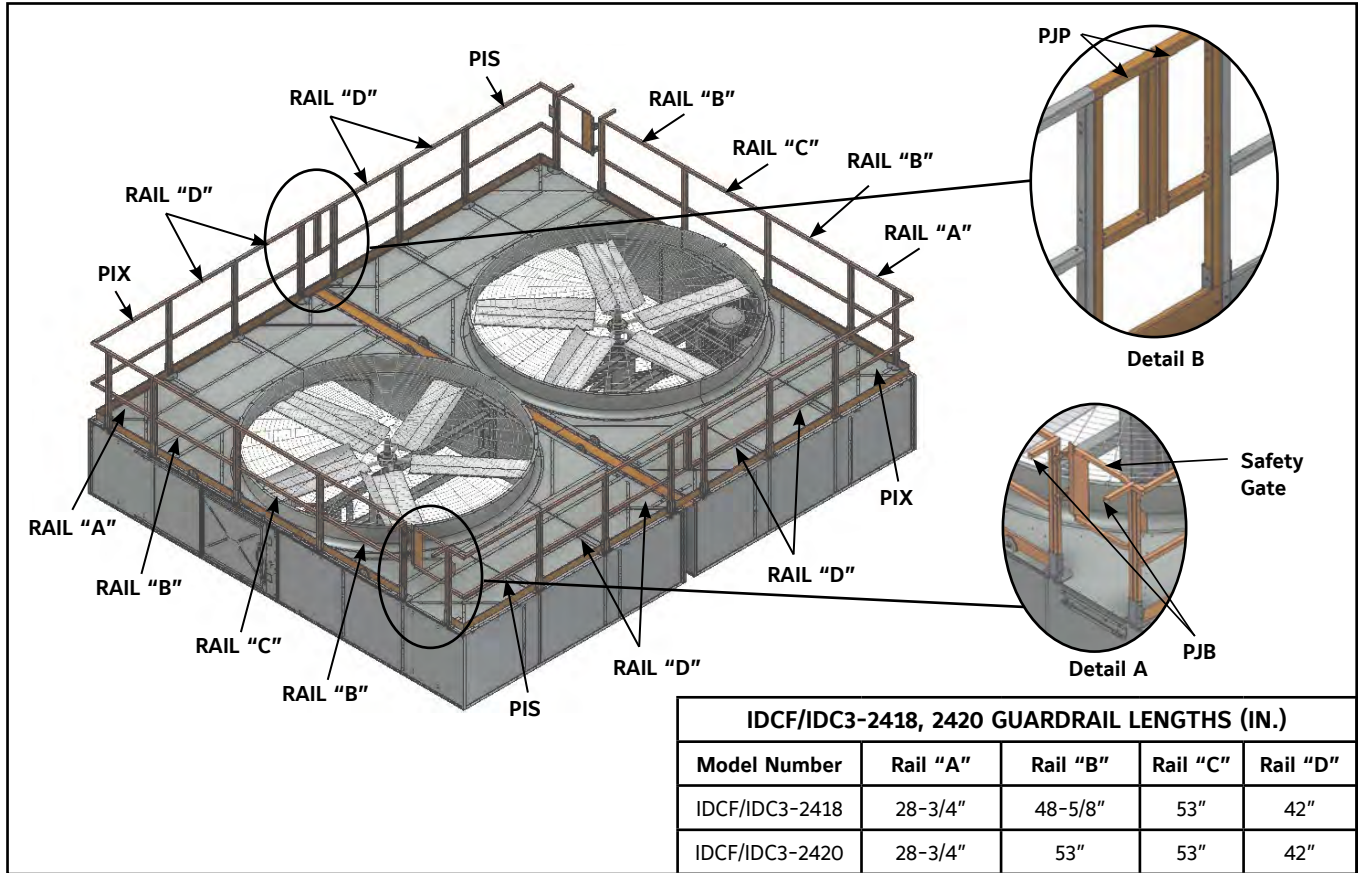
Top Perimeter Guardrails - IDCF/IDC3-2418, 2420
